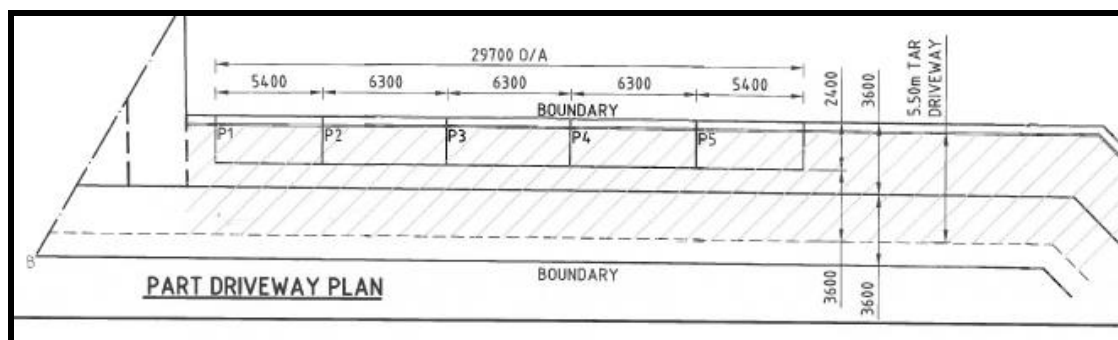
A snapshot of the proposed parking arrangement located in the access way
